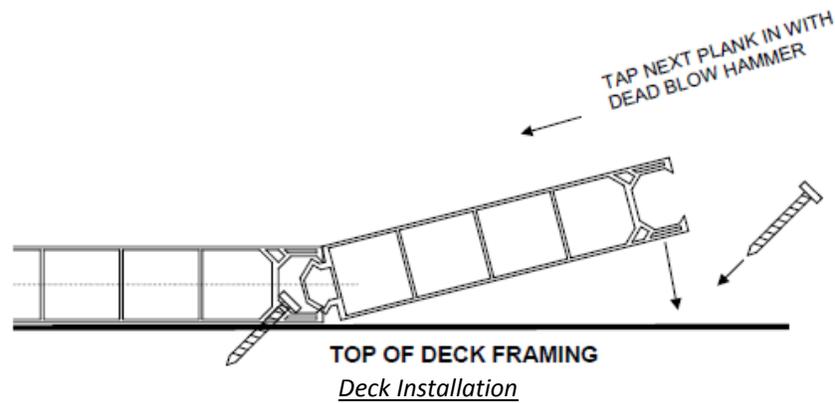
DECK LOK™ INSTALLATION DETAILS
